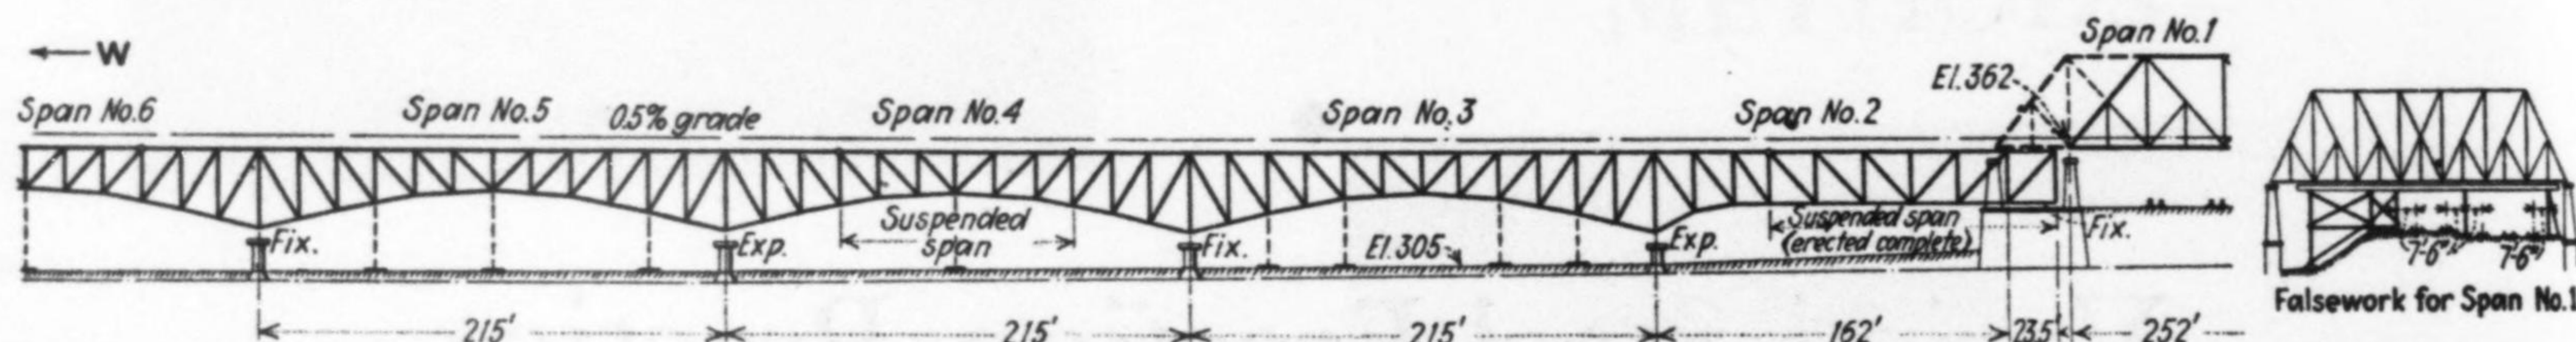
Falsework locations on the American Bridge section. Cantilever trusses, with alternate spans carrying suspended portions, are typical for the full length of the viaduct.
